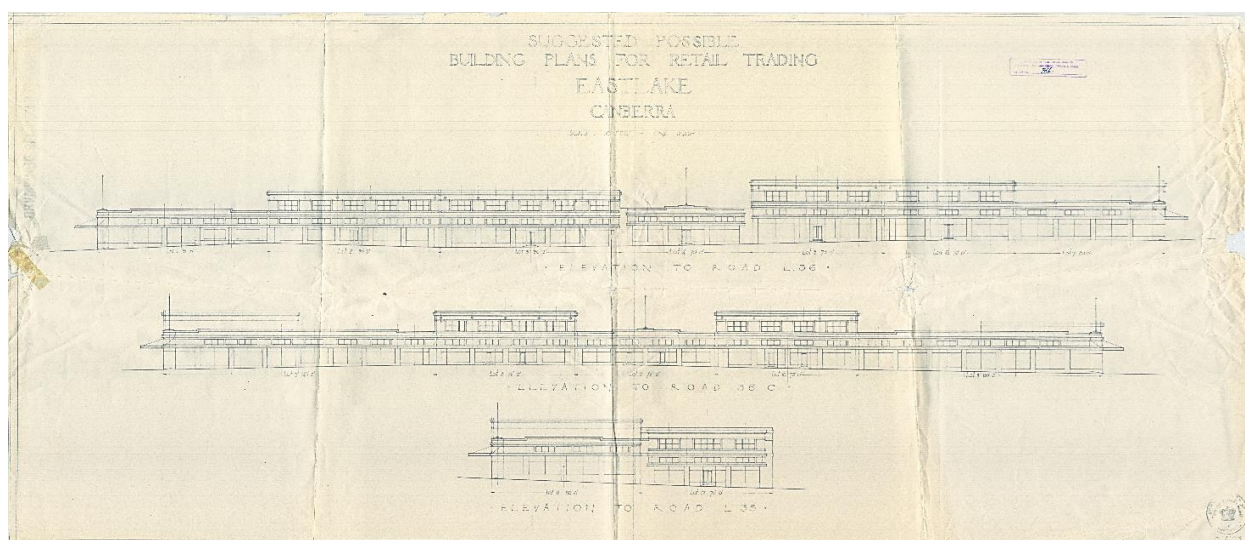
J. S. Murdoch's sketch elevations for the Eastlake retail area 30 April 1925
